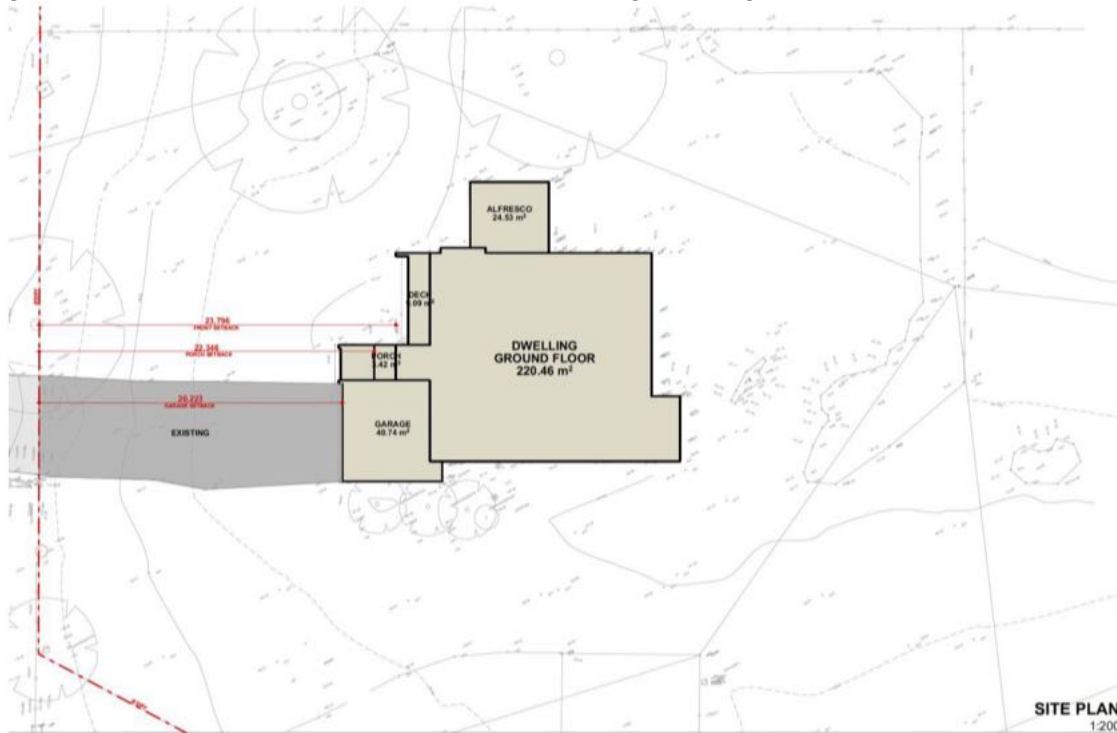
Site plan showing general footprint of the unauthorised slab and brickwork of STRUCTURE 1. STRUCTURE 1, STRUCTURE 2, STRUCTURE 3, and STRUCTURE 4 Are all shown on the WORKS AS EXECUTED SITE PLAN WEA-01 and the detailed survey prepared for the site by Ensure Consulting Pty Ltd
